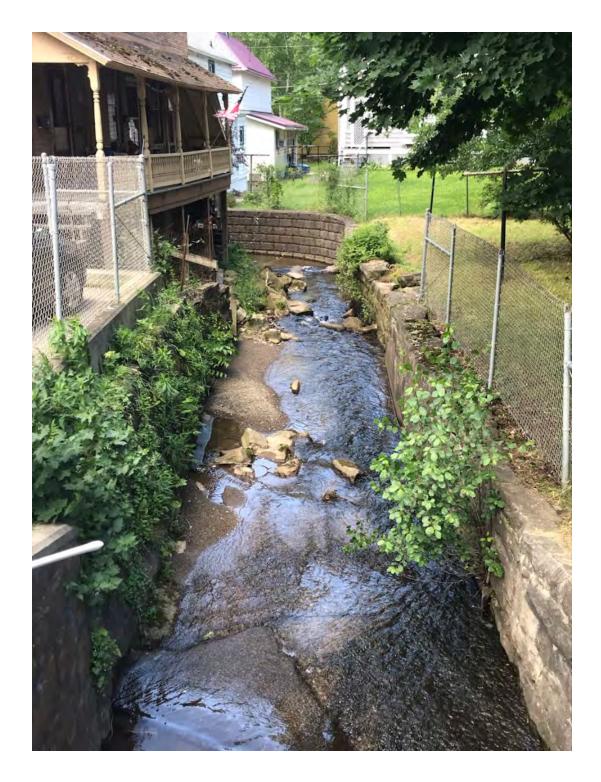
Looking downstream from bridge under Bootjack Road. Gallagher Run is impounded by walls and flows hazardously close to residential structures.
